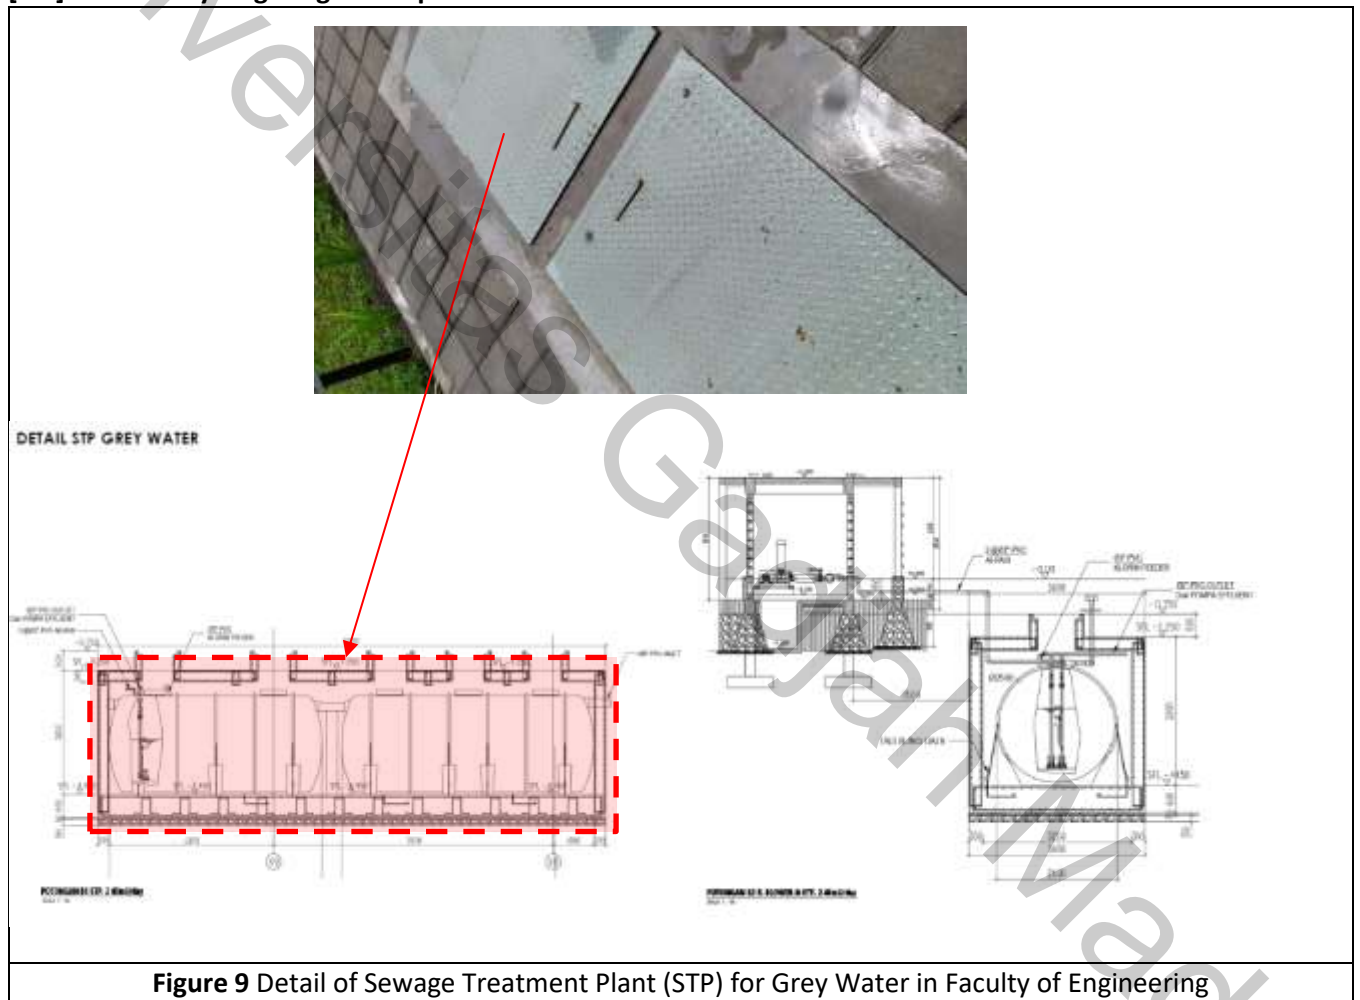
Detail of Sewage Treatment Plant (STP) for Grey Water in Faculty of Engineering
